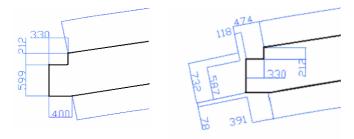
Dimensioning tool. Left traditional CAD dimensioning. Right using our tool.
